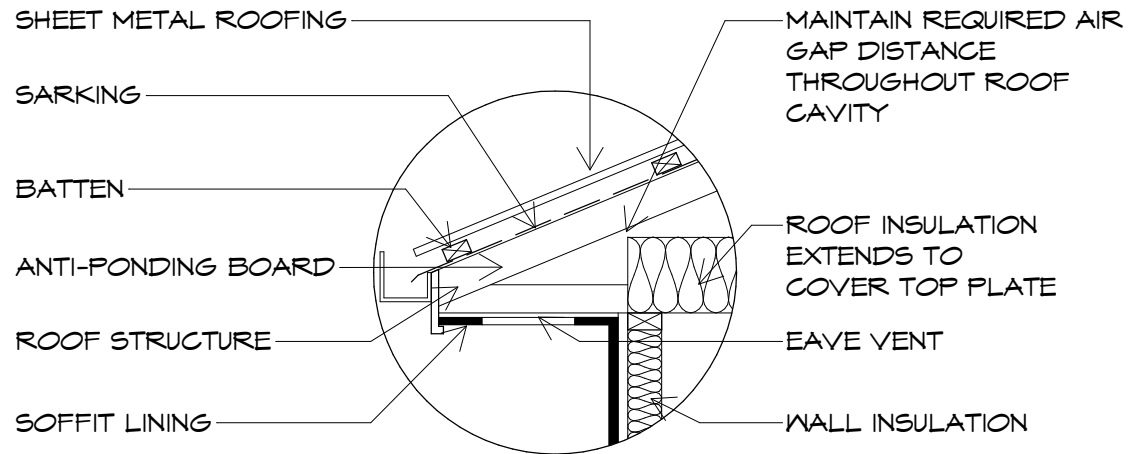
EAVED ROOF WITH EAVE VENT WITH BUSHFIRE CONSIDERATIONS SHOWN
